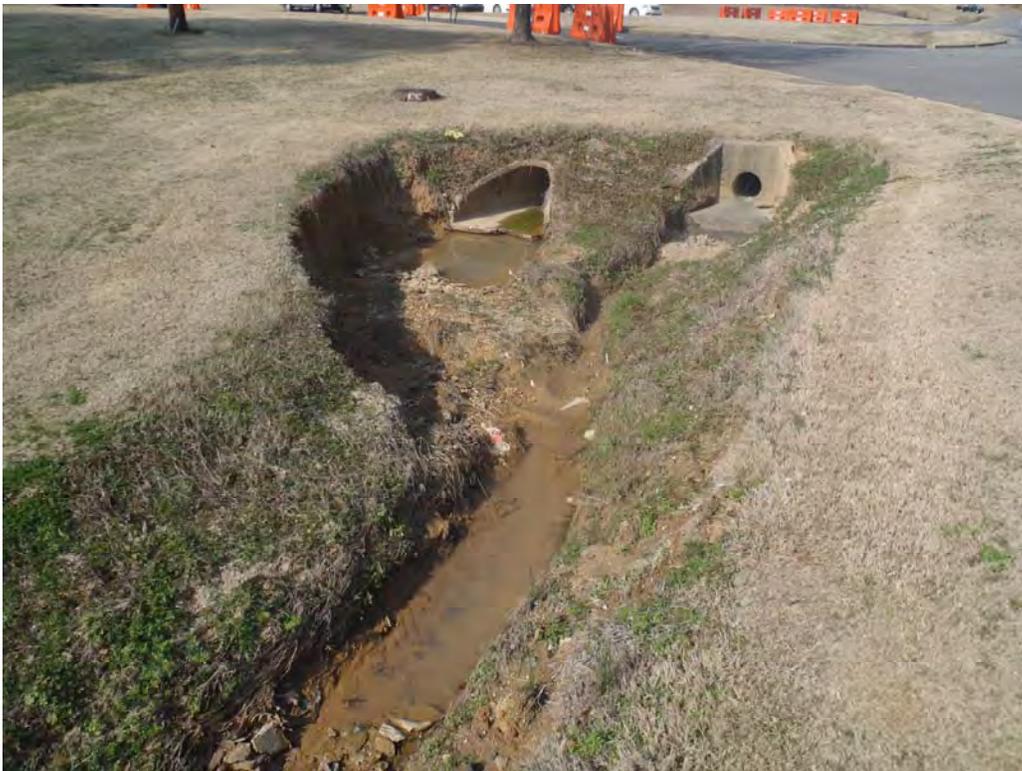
Ditch and culvert at driveway of Highway 82 facing north
